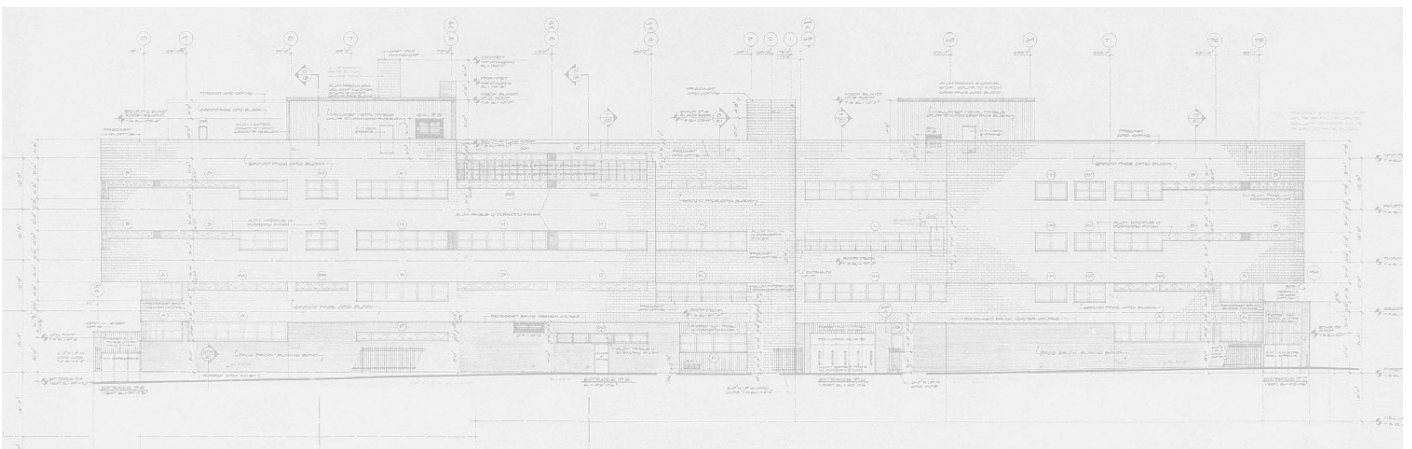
I.S. 131 Architectural Drawings: West Facing Elevation Source: NYC Municipal Archives
